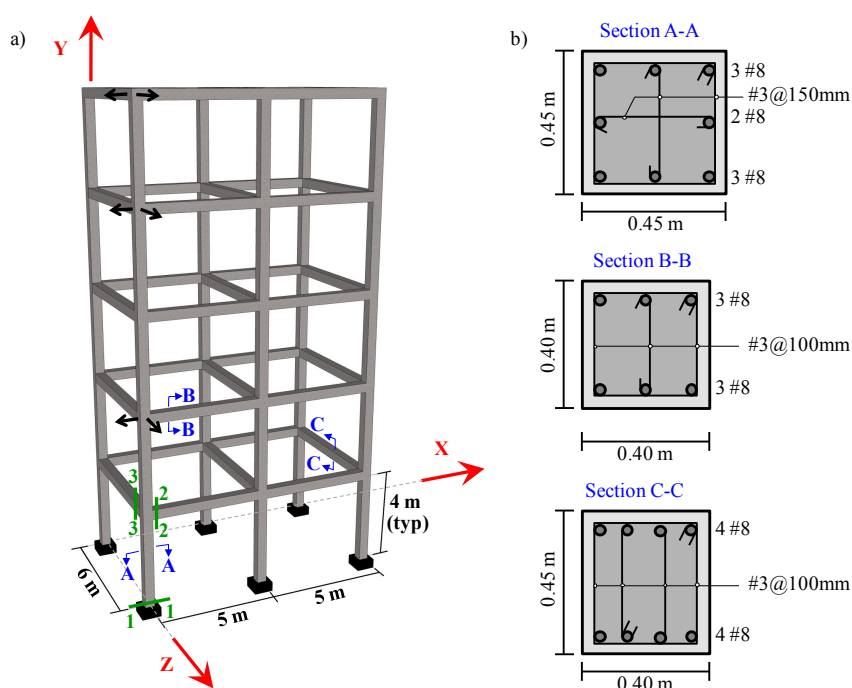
3D RC frame building structure: (a) Isometric view, (b) Cross-section of columns and beams elements.
